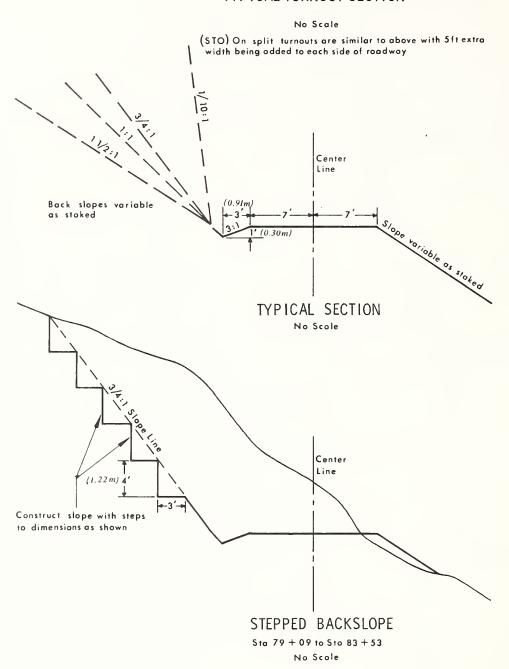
Typical sections for turnouts, cut-and-fill slopes, and stepped backslopes.
